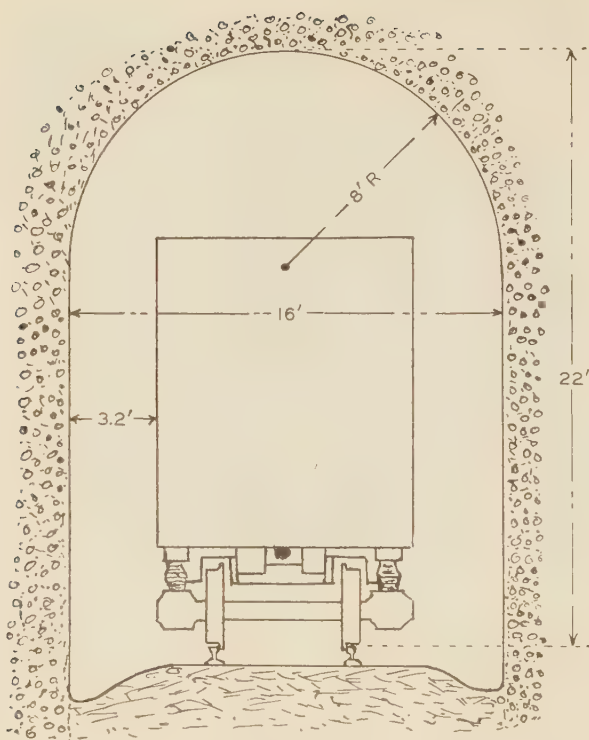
STANDARD CONCRETE-LINED SECTION; MOFFAT TUNNEL
